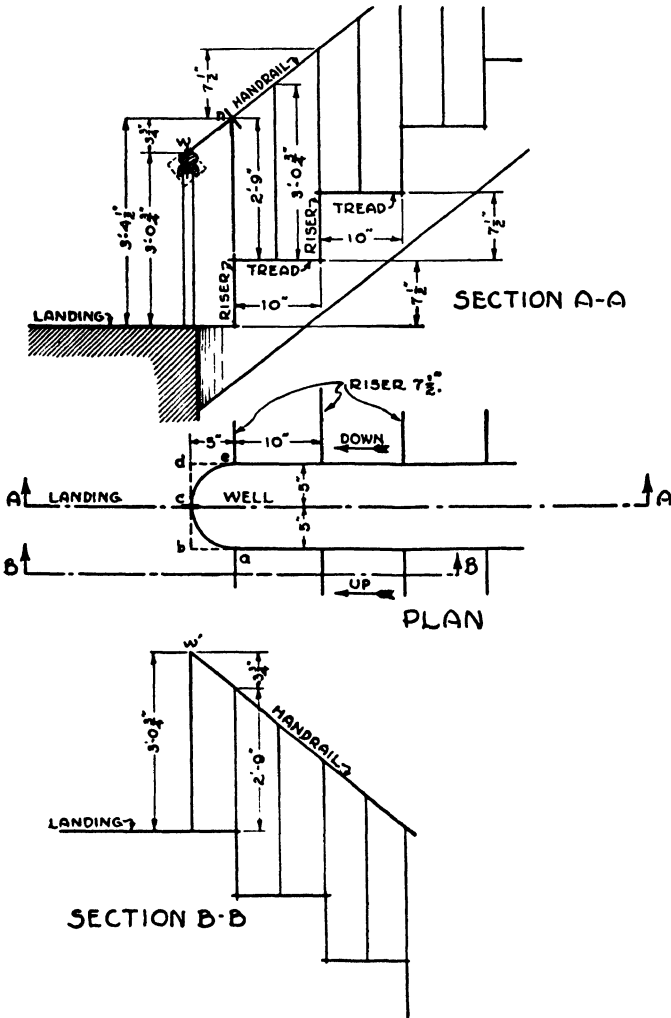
Plan and Sections of Geometrical Stair Showing how Risers Should Be Placed
